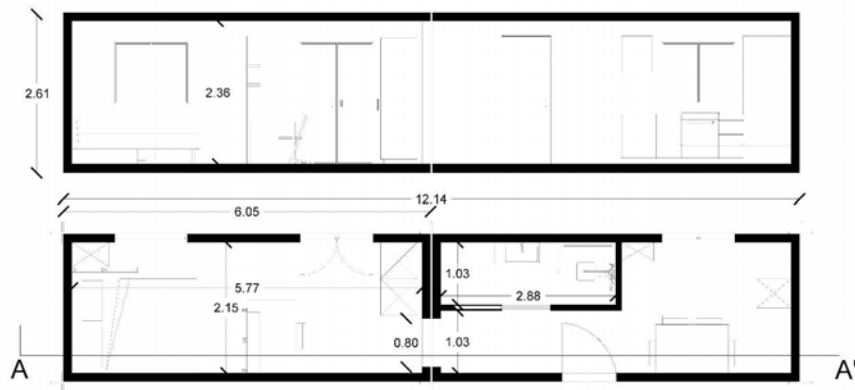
Binnen bleiben – Floor plans of double container<sup>73</sup>
